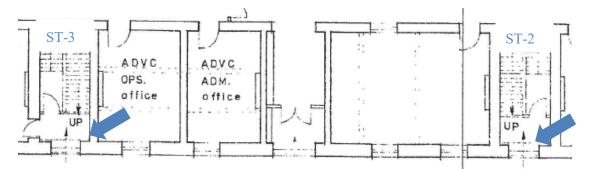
Direction of exit for Stair 2 & 3 in 1988 G/F plan [ArchSD modified by author]
